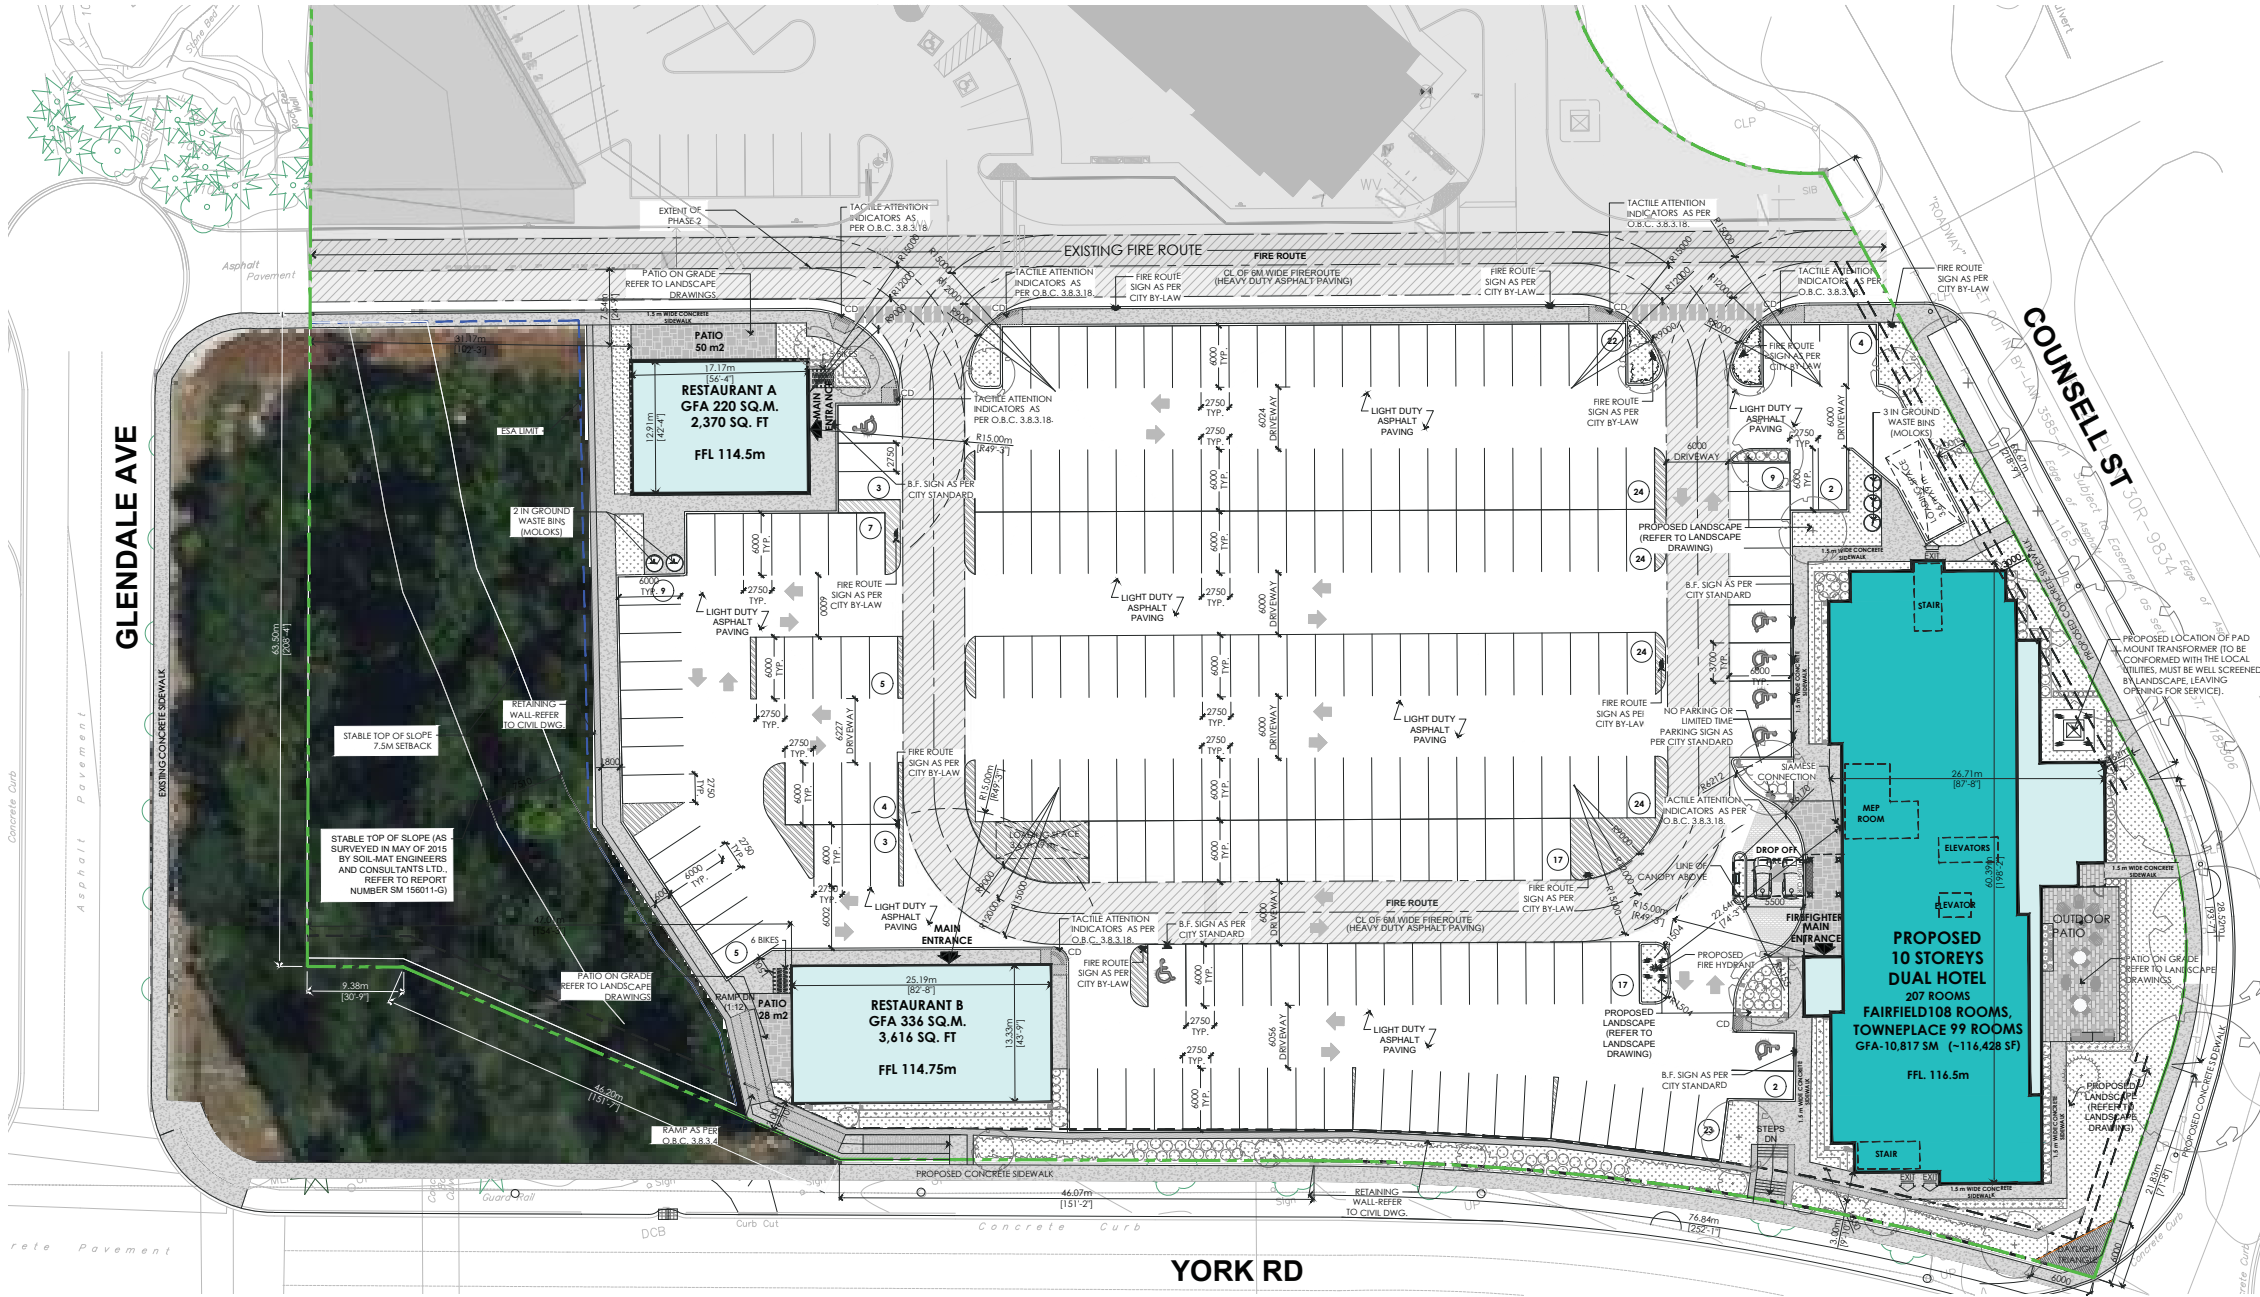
Site Plan (Prepared by Mataj Architects Inc.)
